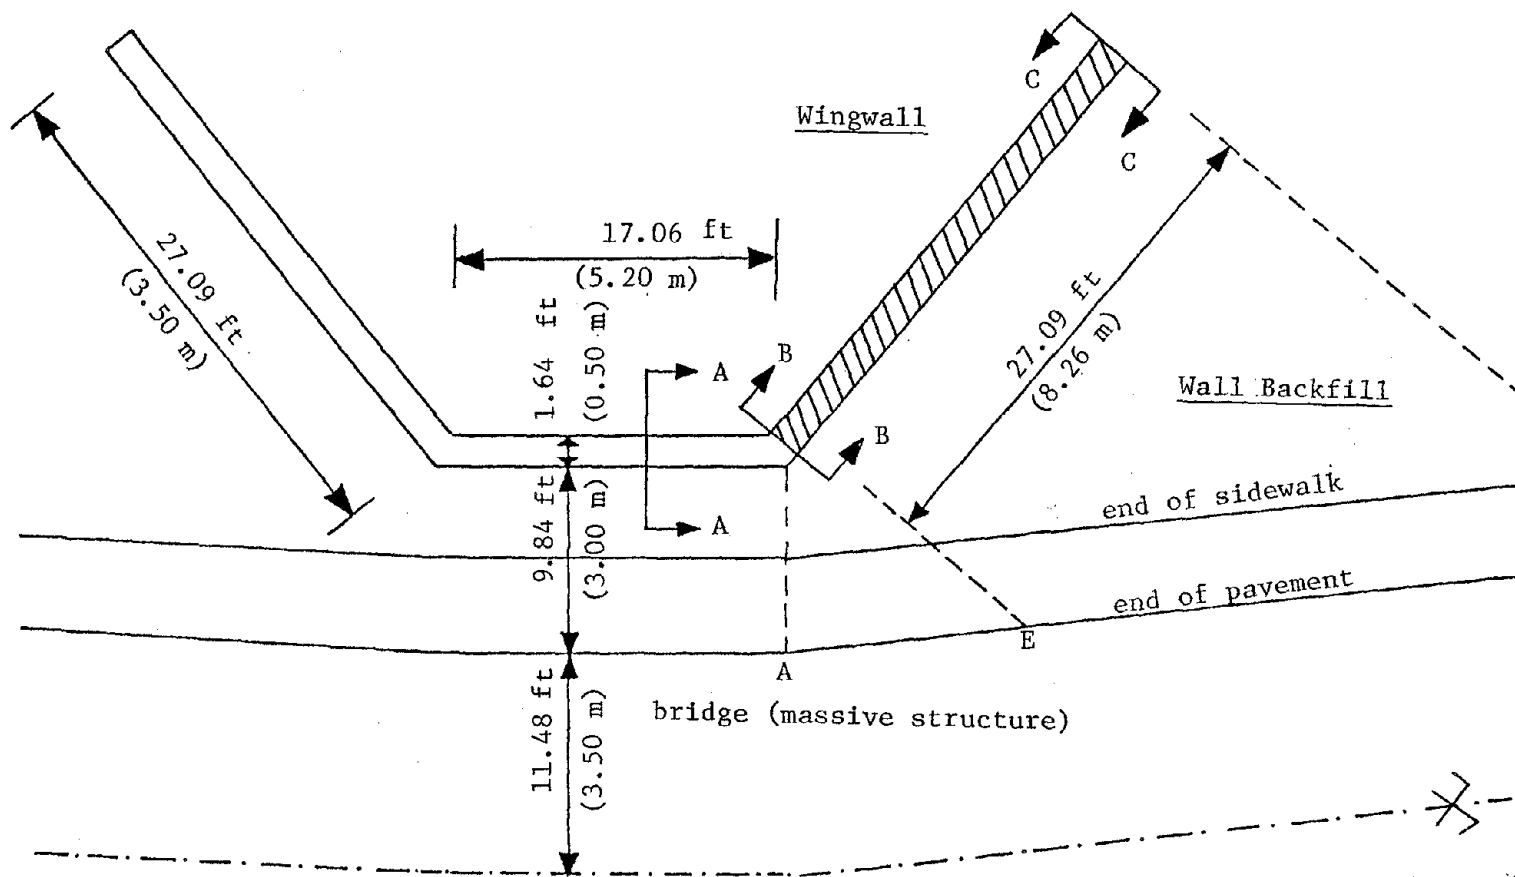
PLAN VIEW OF THE WINGWALL AND ADJACENT STRUCTURES
